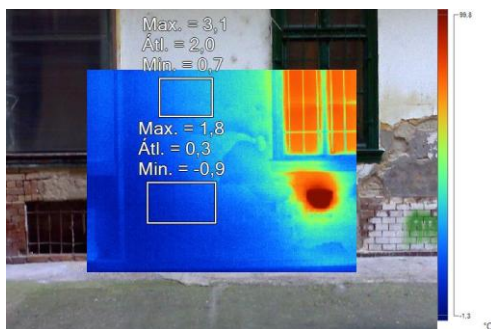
Façade (facing courtyard) with window and wall-mounted gas convector flue exhaust
